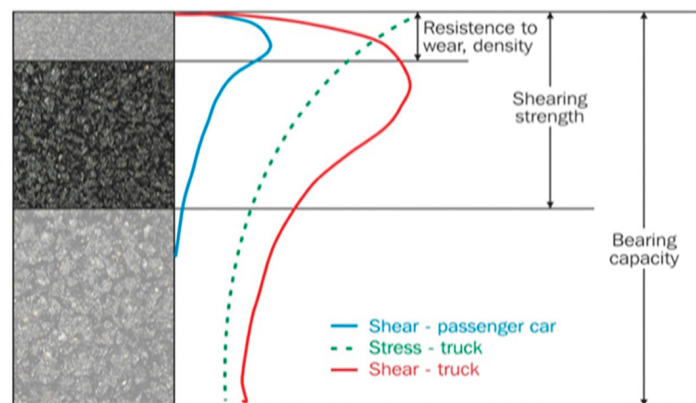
Asphalt Pavement - Shear and Stress distribution in pavement due to loadings
